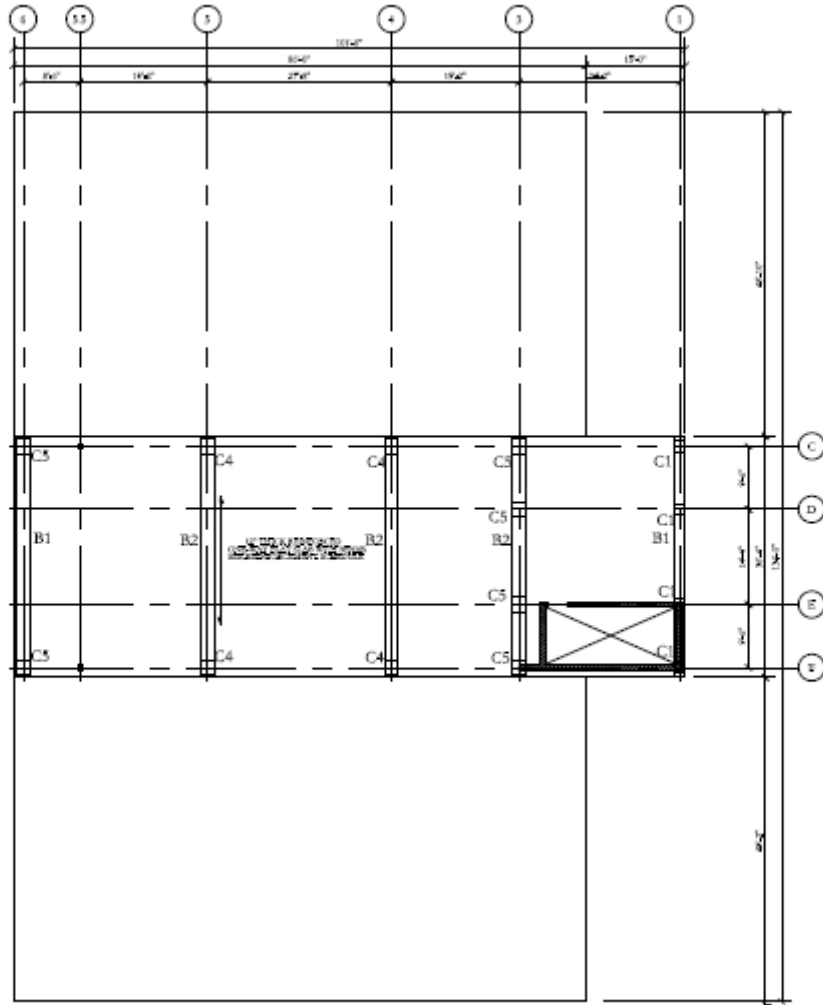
Proposed Concrete Structural System 6th Floor Framing Plan
